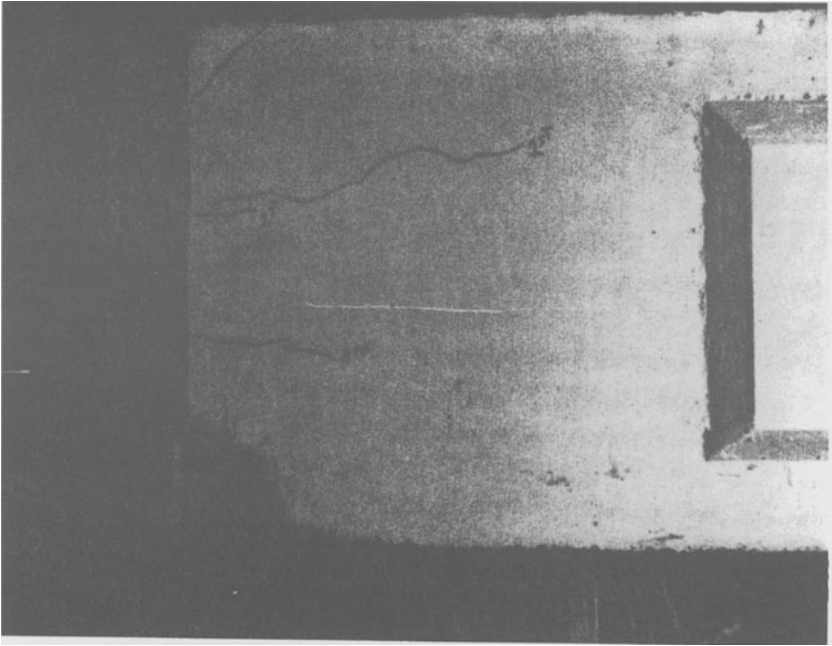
Lower Bursting Crack and Upper Corner Spalling Crack
